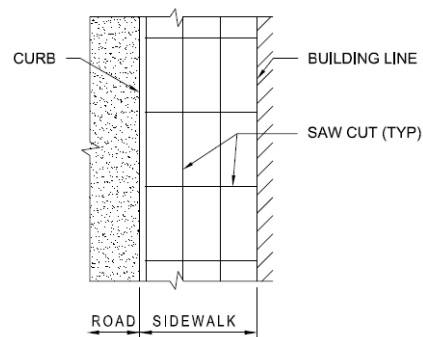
Plan view of example concrete slab on grade walkway with saw cut joints.
